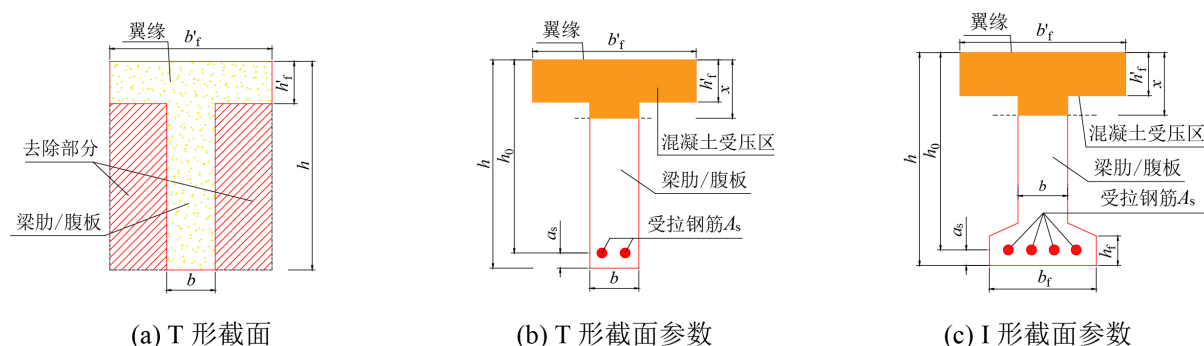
Types of cross-section of singly reinforced T-shaped beam
